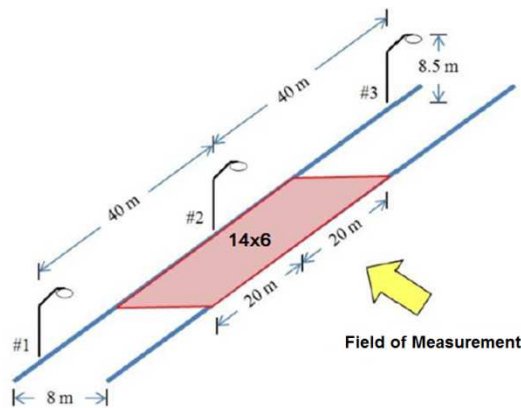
Road Lighting Installation for HPS 250W and LED 140W
